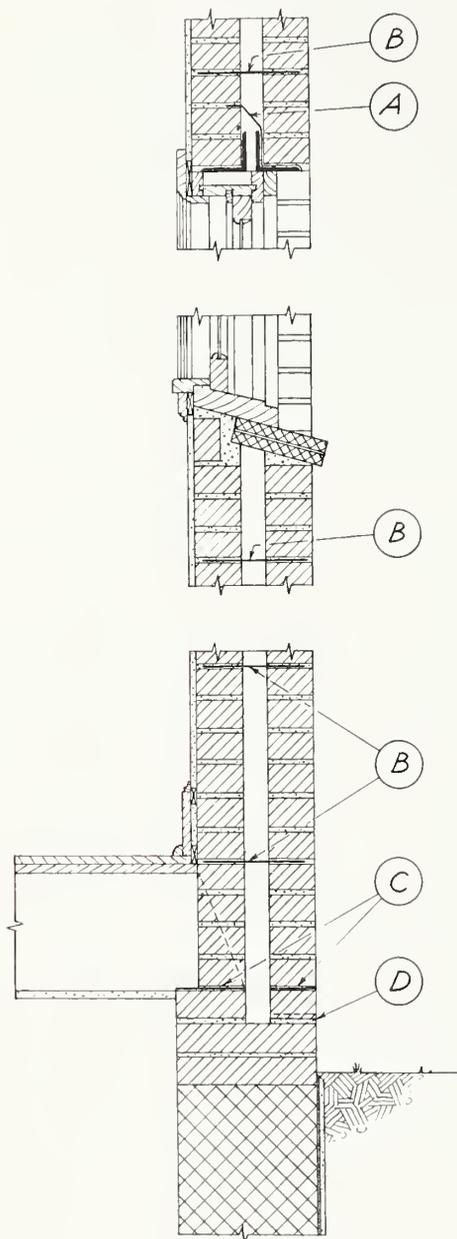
Lintel flashing and damp check for cavity walls.
